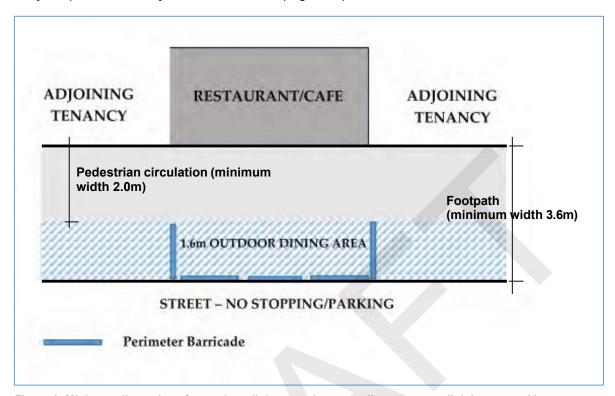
Minimum dimensions for outdoor dining on primary retail streets not adjoining car parking.
